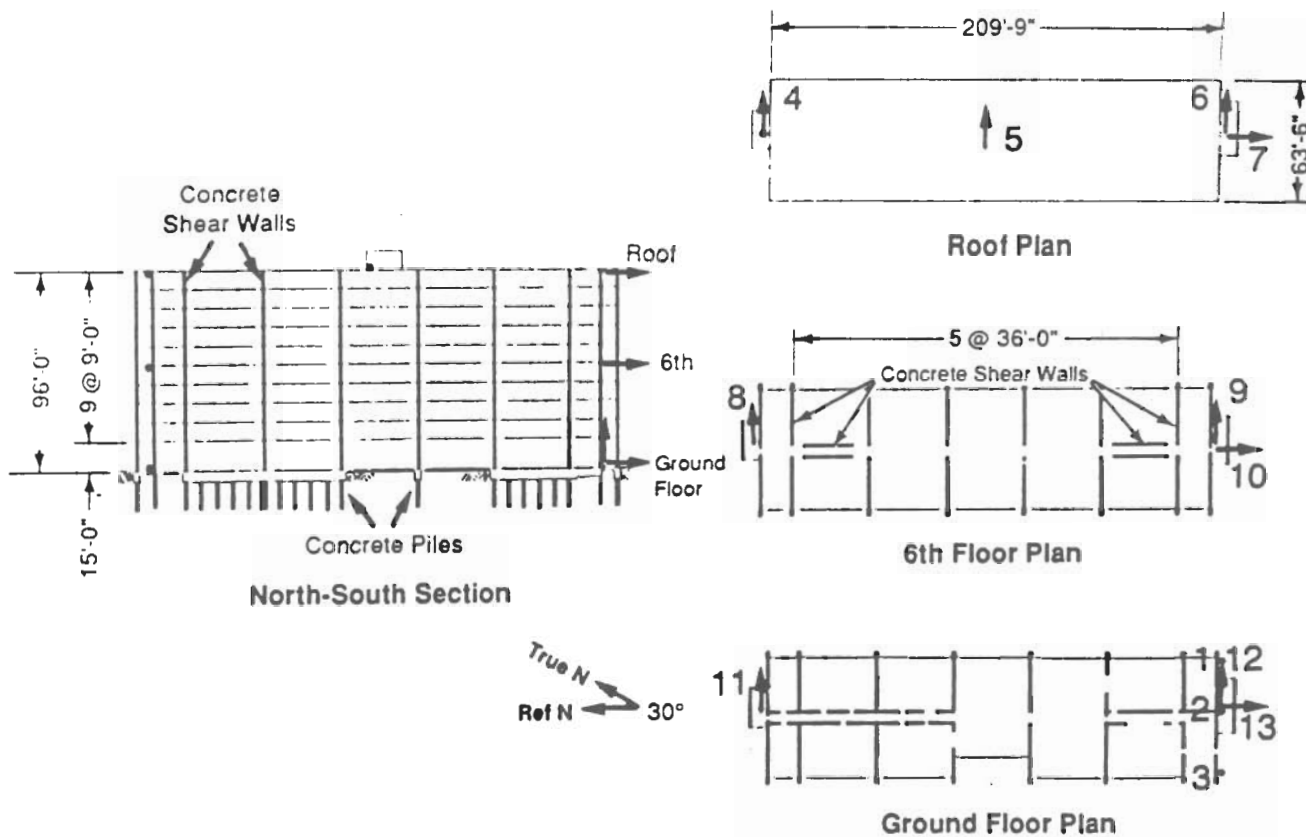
Building #2 - 10 Story Residential Building, San Jose
